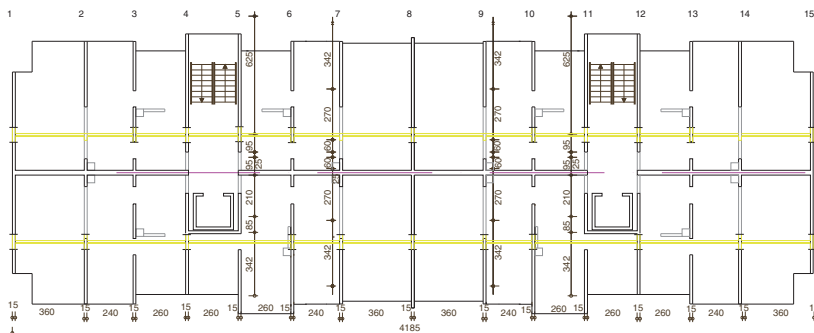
Typical multistory R.C. walls building (Groundfloor + seven/eight stories), regular structure
